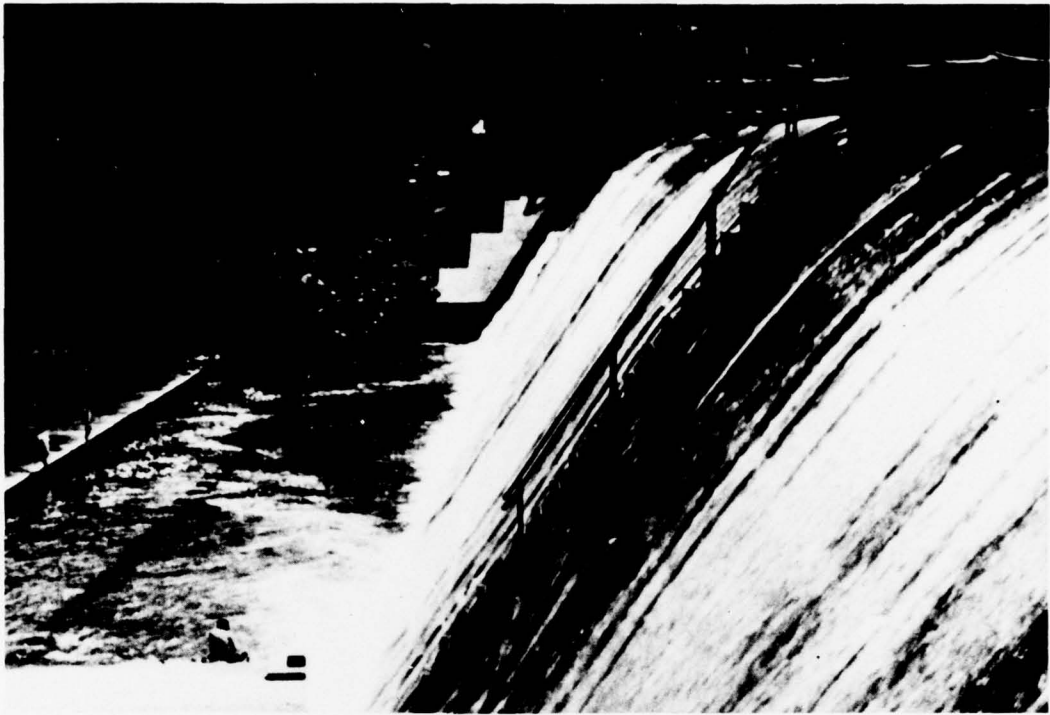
View of Dam, Left Chute and Stilling Pond From Abutment Area
